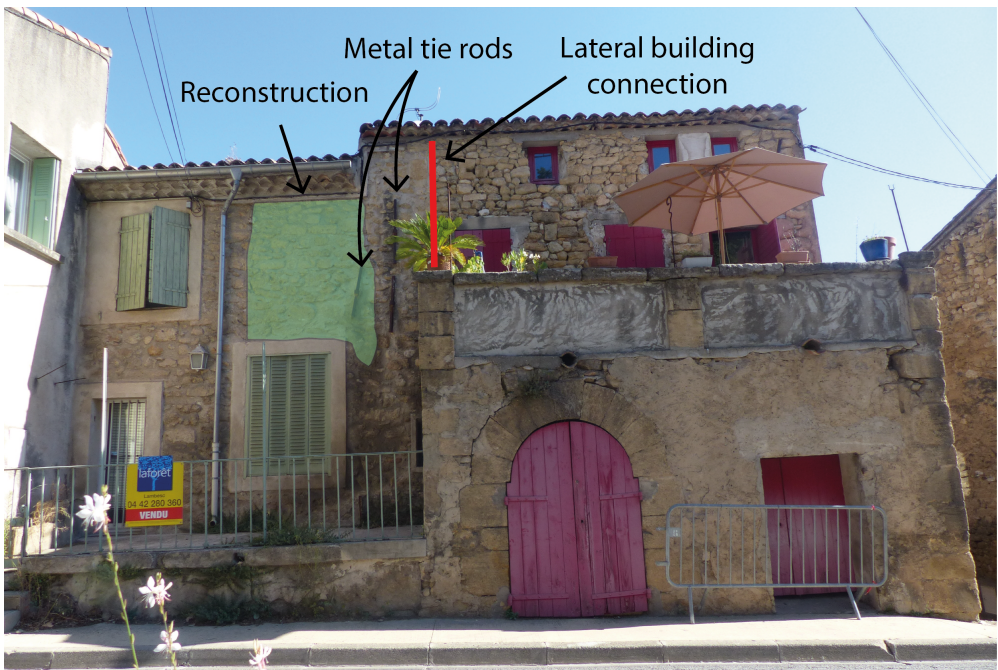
Reconstruction along two buildings (Avenue de Lambesc, Rognes).
